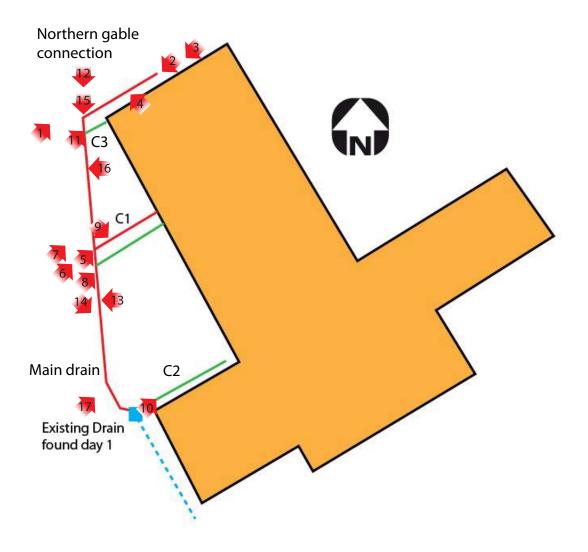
Location and orientation of drainage trench photographs at Bodidris Hall, Llandegla.
